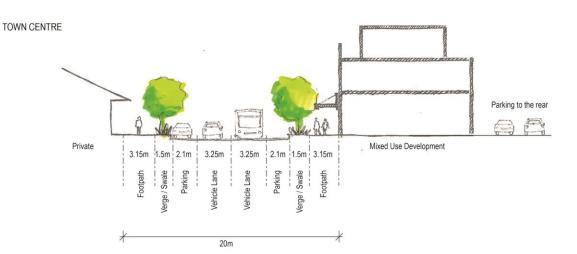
Tuakau Town Centre typical road cross sections: West Street, showing three storey mixed use to east and parking to rear
